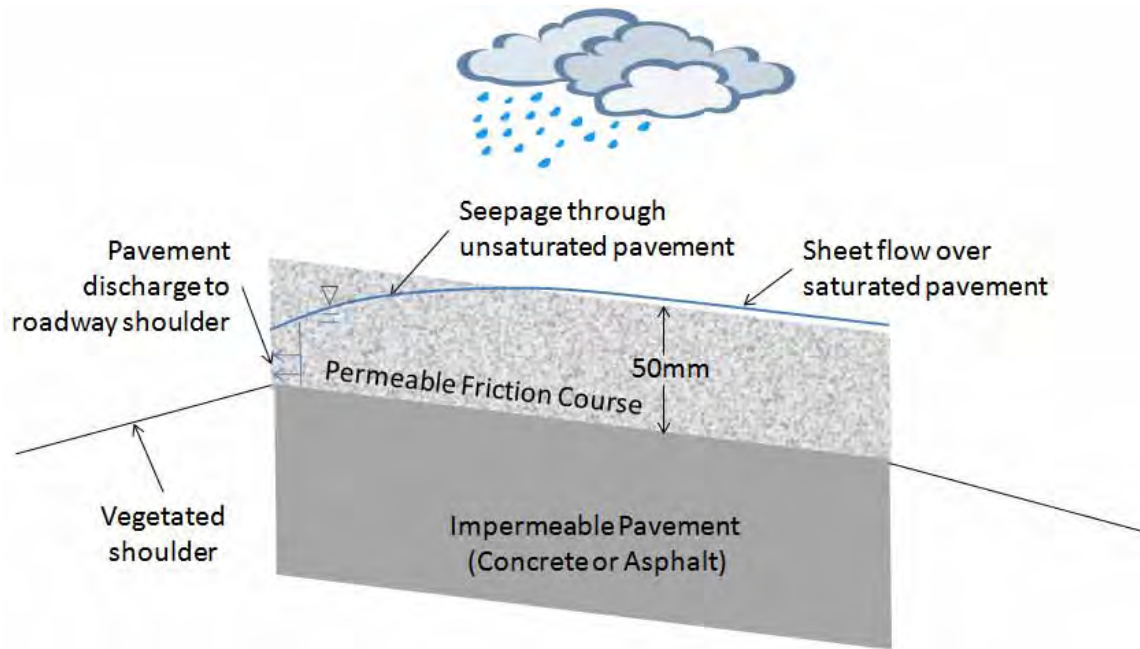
Schematic cross section of a roadway with a PFC overlay
